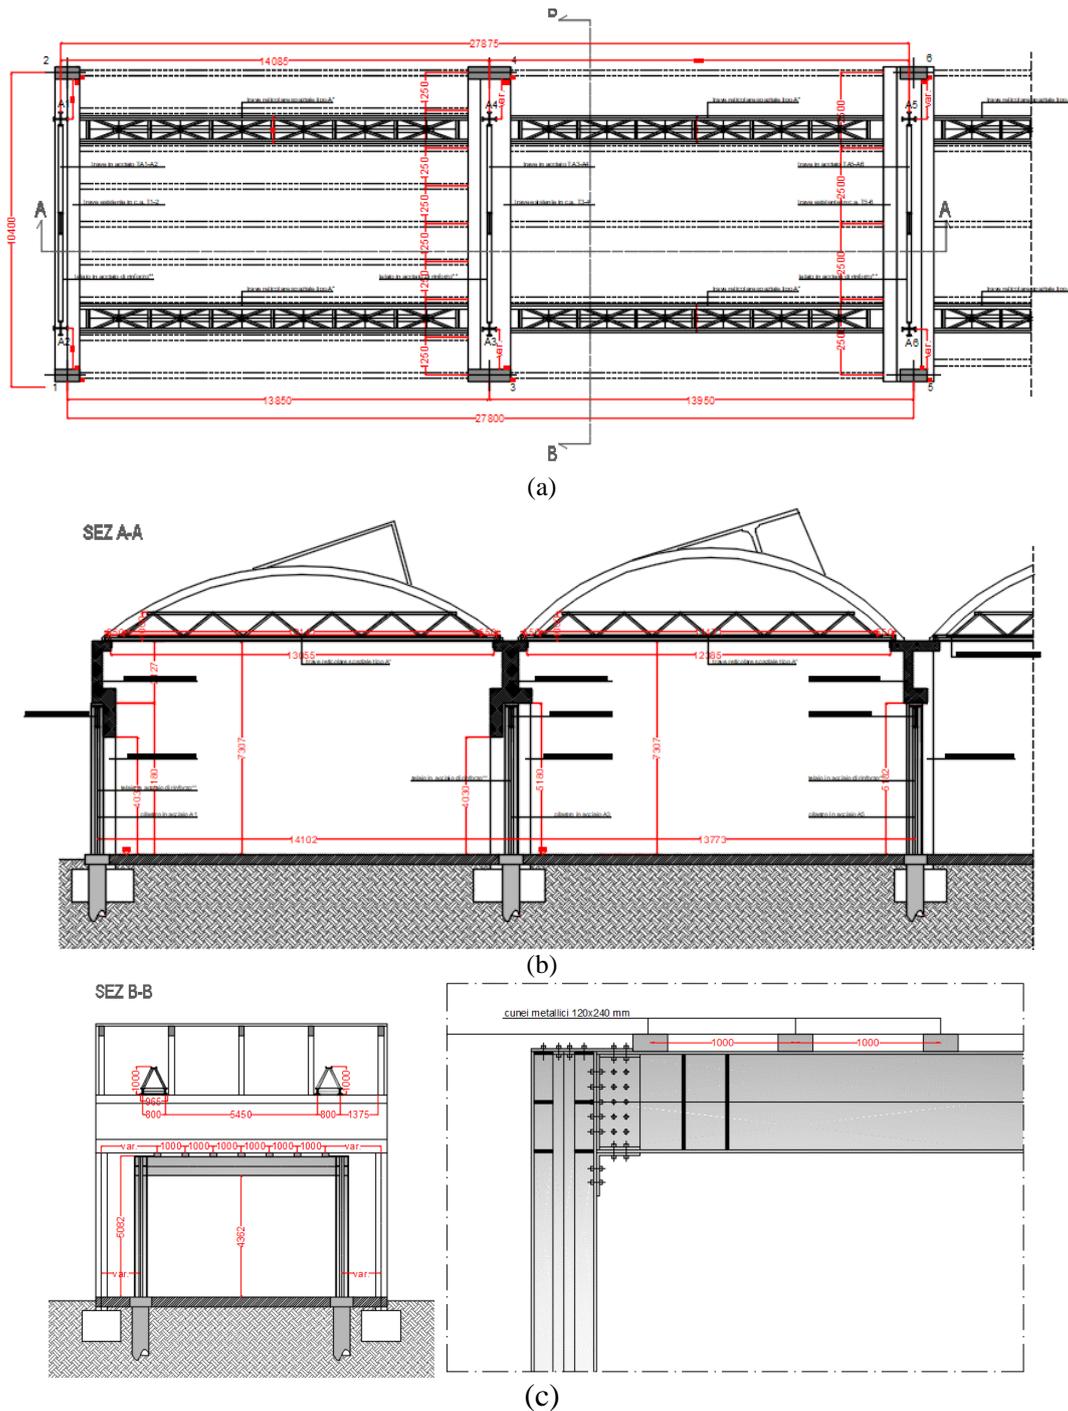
(a) View of plan with parallel RC frames and steel truss beams; (b) section and (c) details of steel frame.
